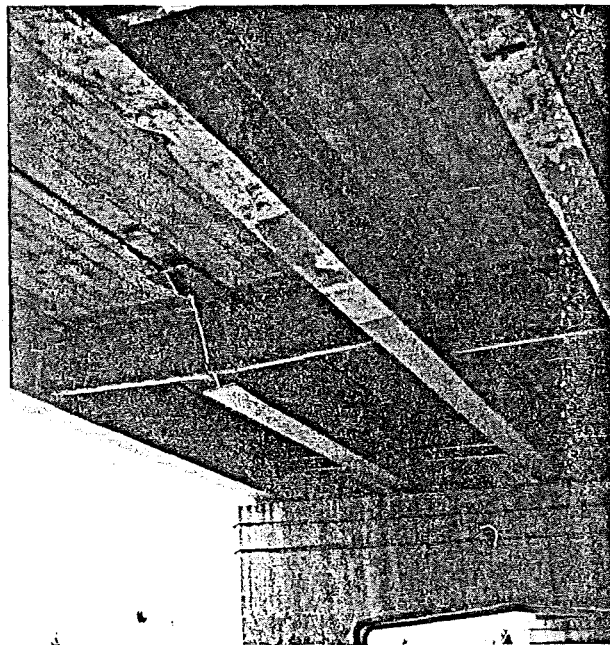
First interior beam fractured at the connecting diaphragm and dislodged from bridge.
